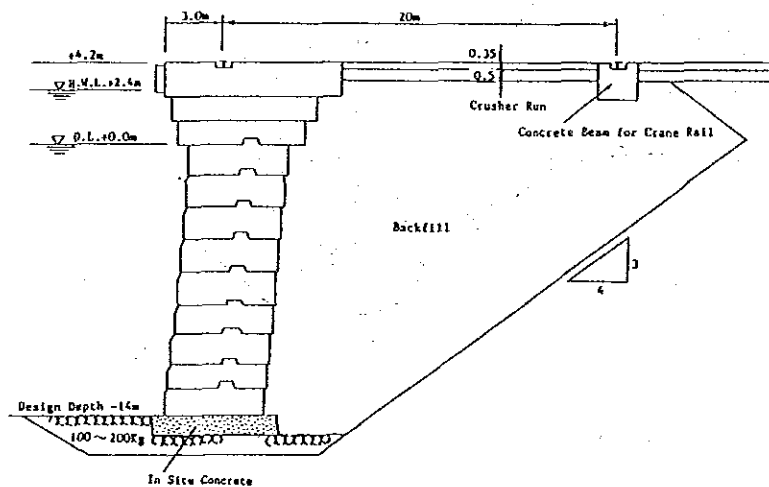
Proposed Cross Section of the Bank (-14m)
